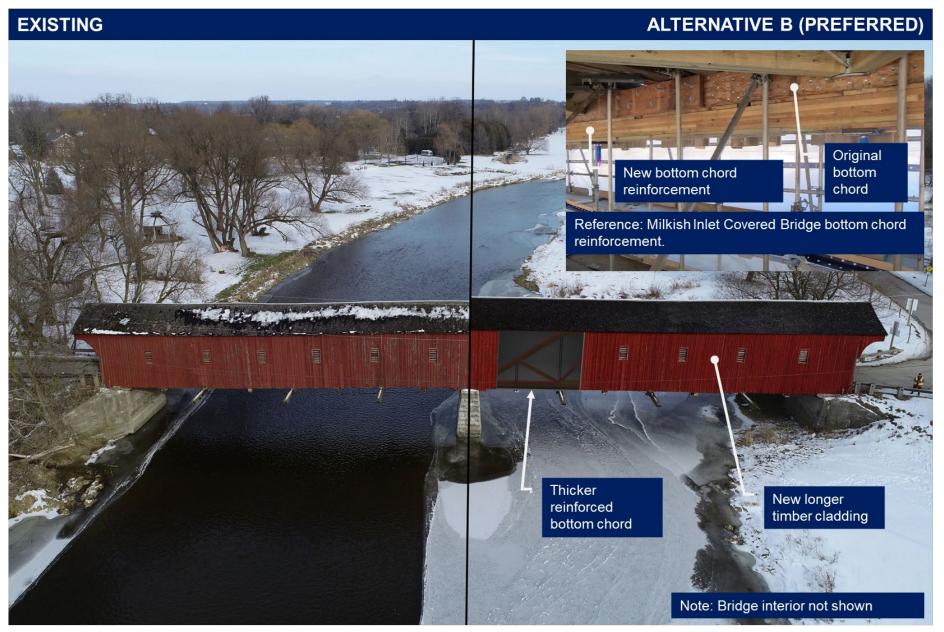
Elevation View – Existing and Alternative B (Timber Truss Reinforcement)
